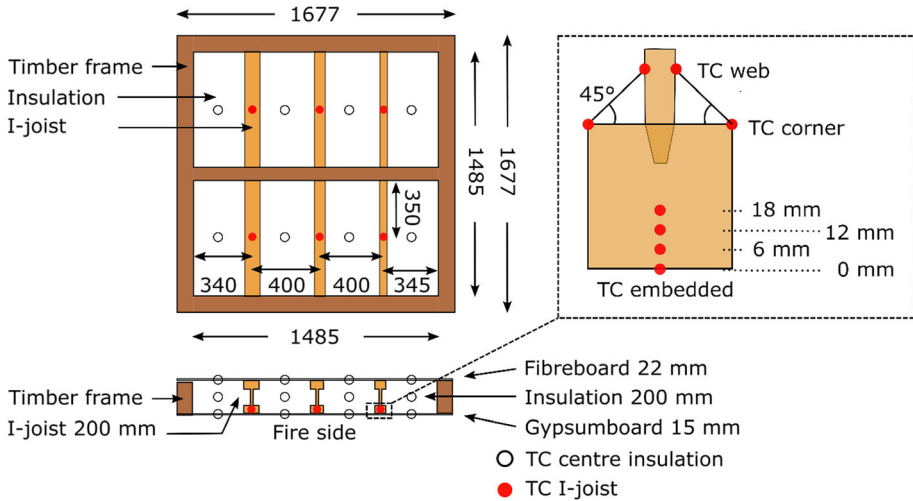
Build-up of test specimen in plan and cross-section, and position of thermocouples. Dimensions in mm.
